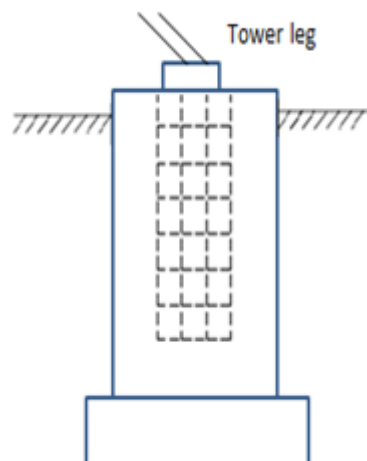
Concrete foundation encasing tower leg, via steel rebar, as per Eskom Standard [2]
